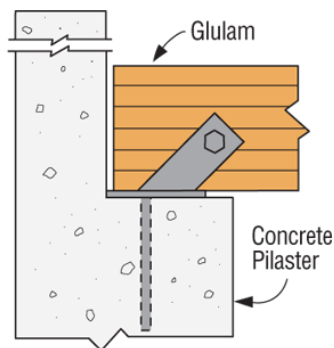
Typical GLB installation on a concrete pilaster, except the supported glued laminated wood beam must bear on the full depth (PD) of the bearing plate. This drawing is intended to emphasize the code requirement of providing a 1/2-inch air space between the end of the glulam wood member and exterior concrete as required by Section 2304.11.2.5 of the 2006 IBC.
